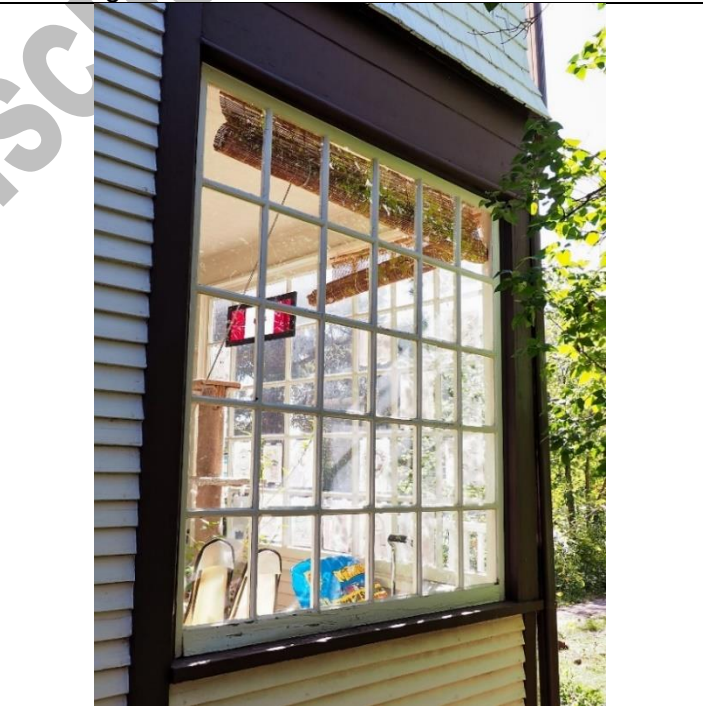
Example of fixed, multi-light wood sash windows on inset veranda
